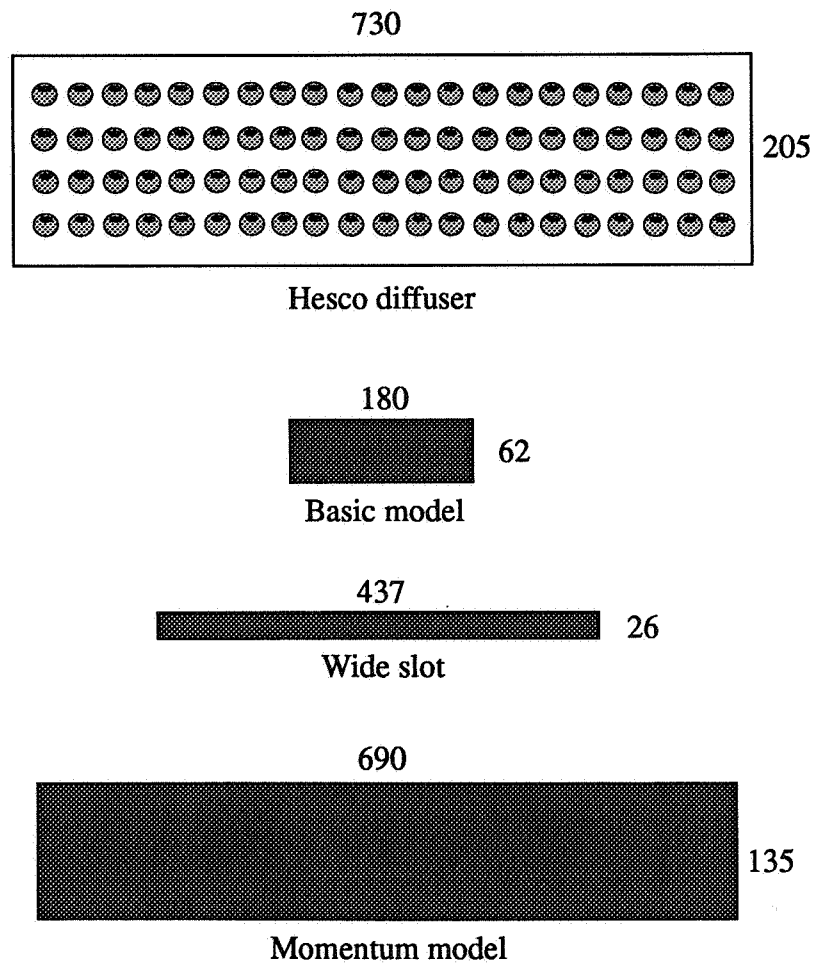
The 84-nozzle supply air diffuser and the methods to replace it by a simple opening. Dimensions are in millimetres.
